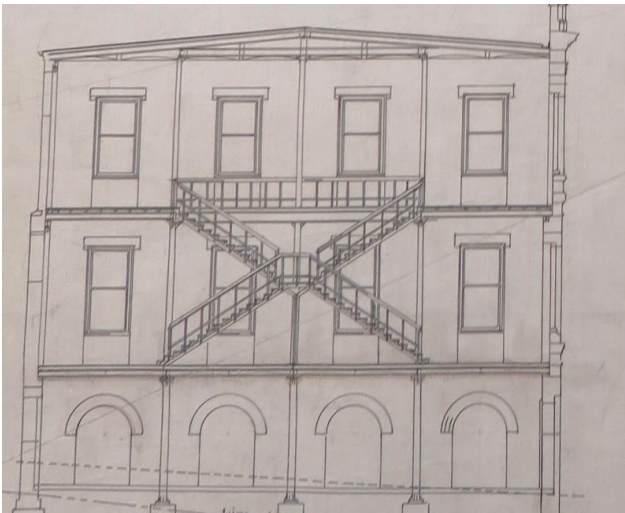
Section C-D of Strong Room (internal section facing towards inner face of western wall – showing the double narrow-u staircase, now removed)
